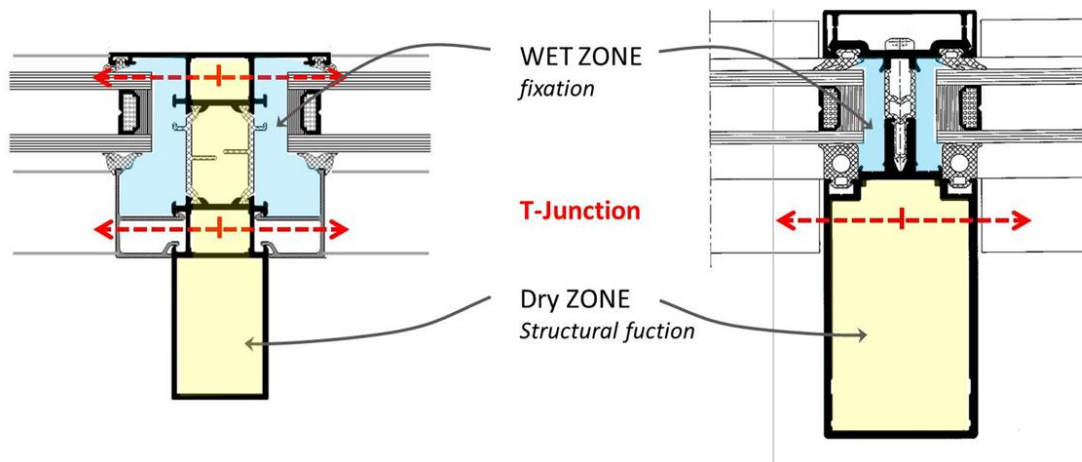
Standard sectional composition of dry zone and wet zone for window systems (left) and curtain wall systems (right)
